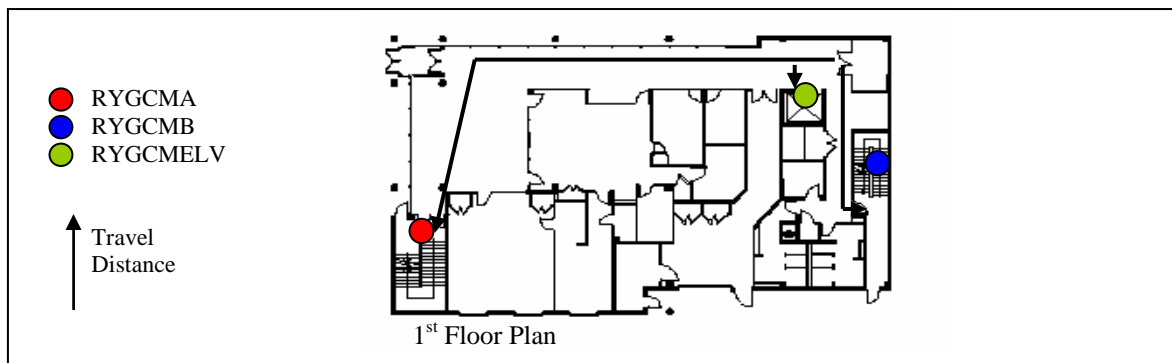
Plan indicating Travel Distance between Stairs and Elevator for Building RYGCM
